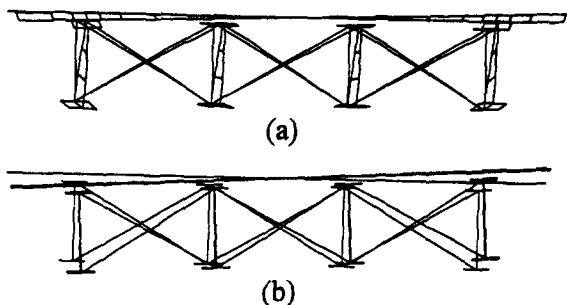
End Views of Deformed Shapes for 40 m Span Bridge at (a) One End; (b) Distance of 8 m from Bridge End
